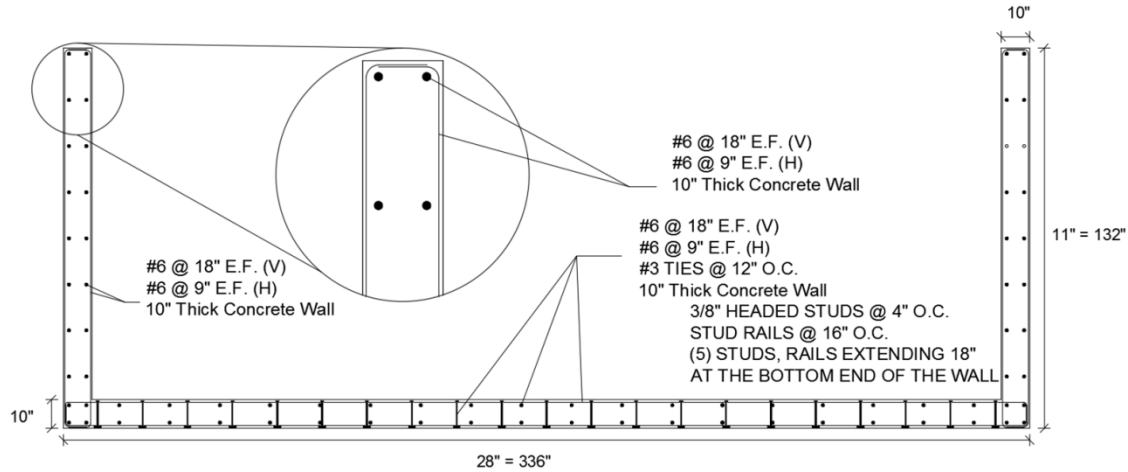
New Elevator/ Mech. Room shear wall cross-section at the 4th floor level
